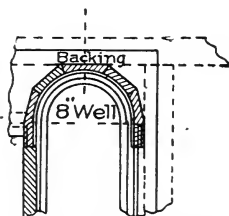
Construction and Trimming of 8-Inch Well-Hole.
